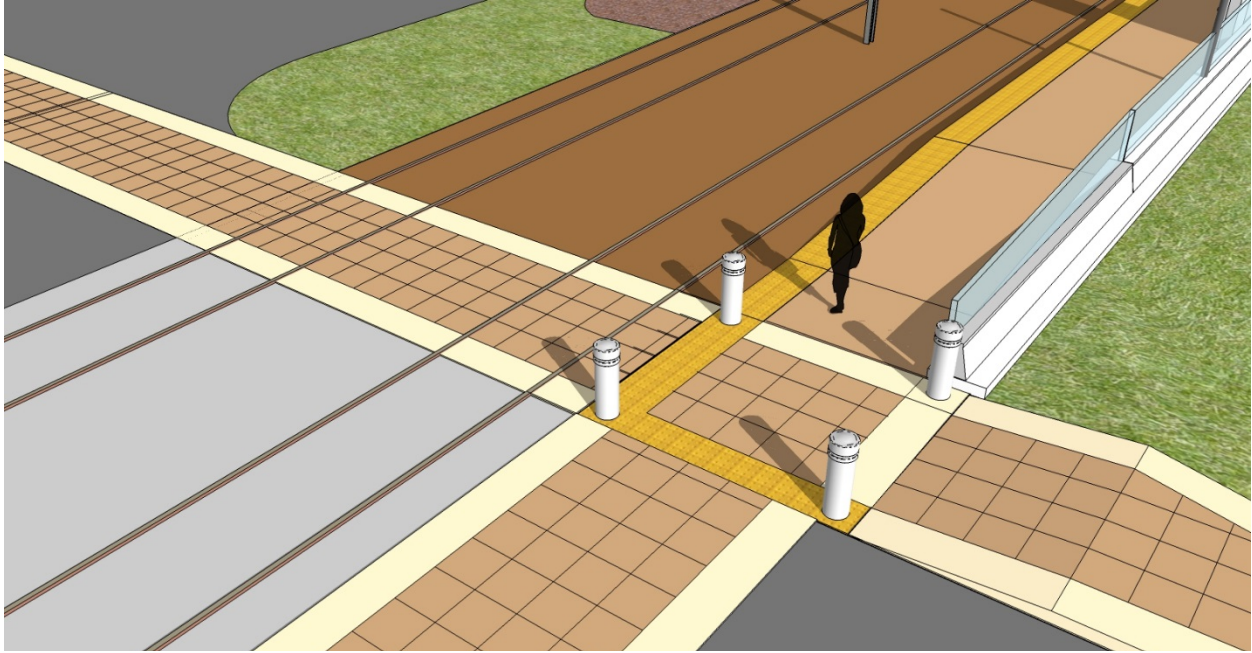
Crossing Treatment, Split Side-Loading Platform Stop adjacent to Landscape Area
